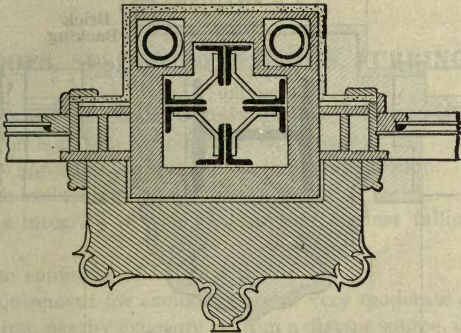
Wall Column Protection, Fisher Building, Chicago.
